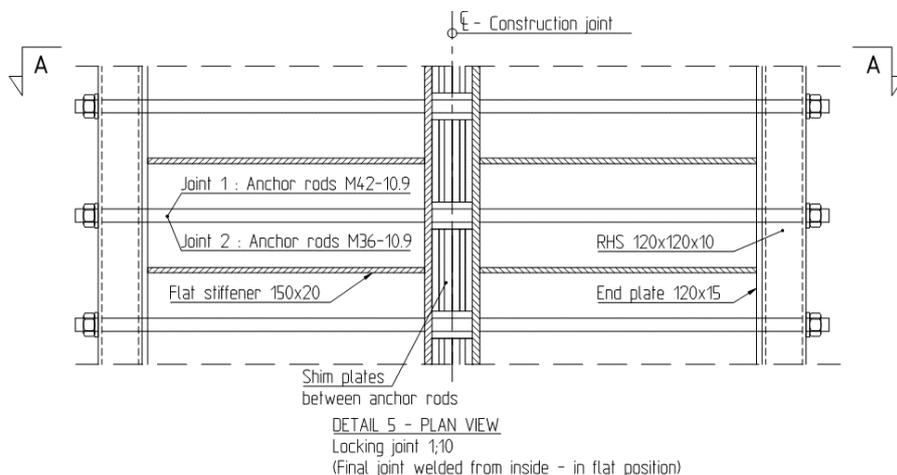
Locking joint for web- and bottom plates, construction joint 1 & 2, plan view
